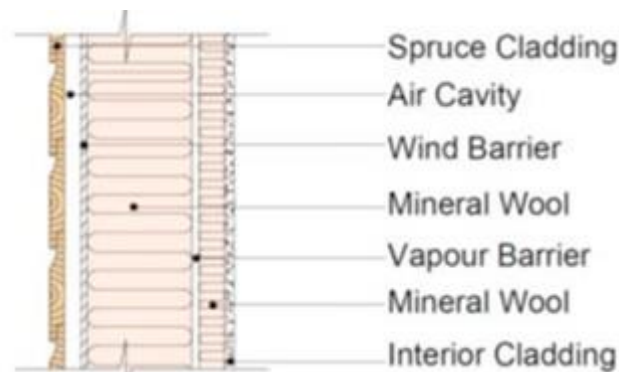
A Typical Timber Building Envelope Section (Gradeci et al., 2018).
